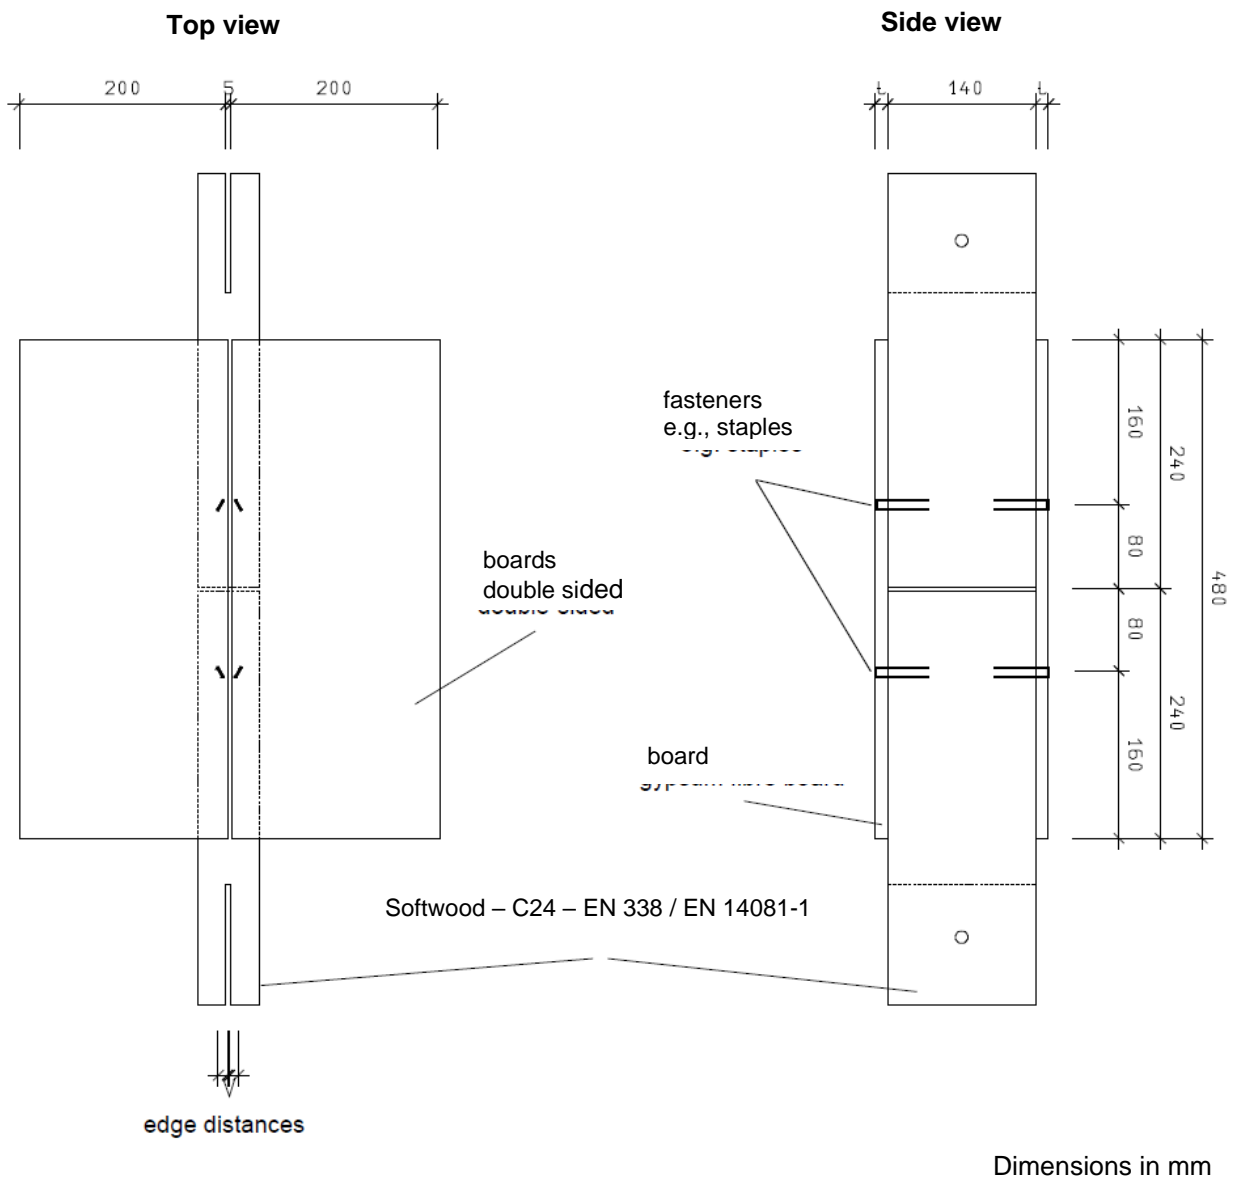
Test specimen of the fastener tests under stress of the fasteners parallel to the edge in top view and side view
